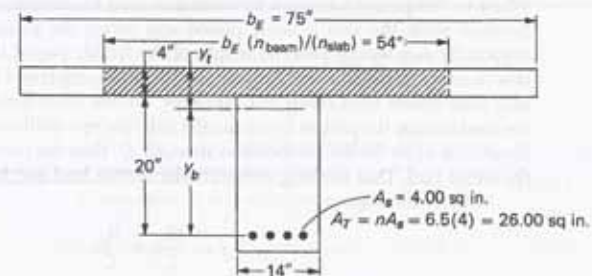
Precast beam and cast-in-place slab composite section for Example 22.5.2.
